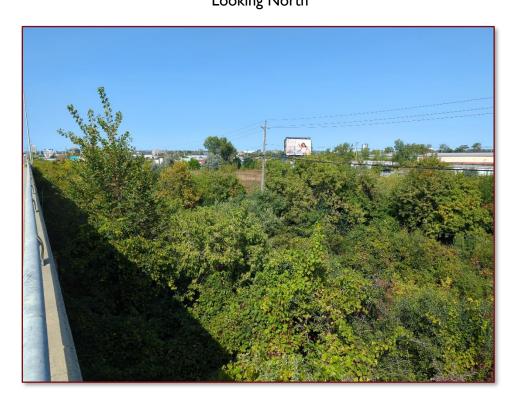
St. Laurent Boulevard – Inactive Railway Corridor and Raised Road
